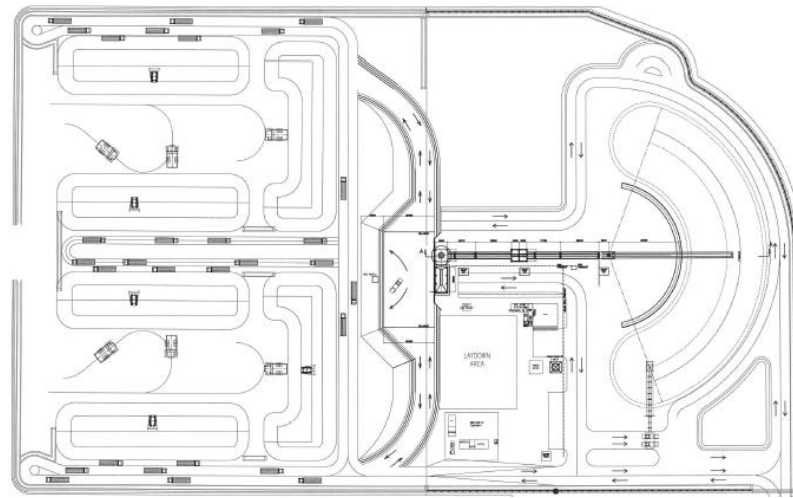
Layout Plan of Coal Crusher Conveyor System at SPE #2
